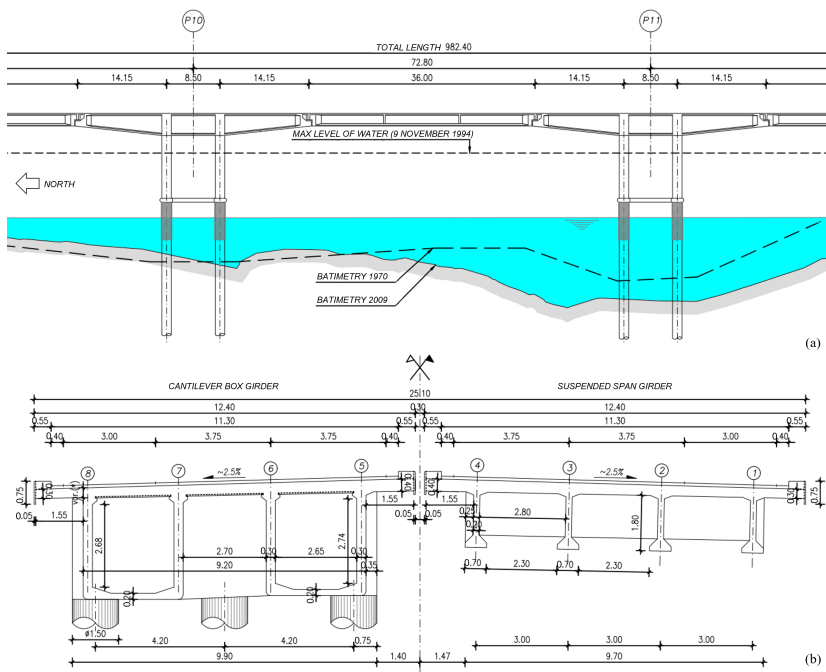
(a) Longitudinal section of Piers 10 and 11 and (b) cross sections of the A22 Po River Bridge. Dimensions in meters.
